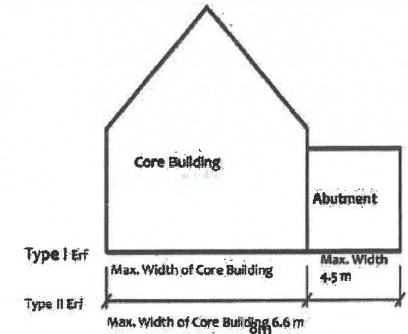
Diagrammatic section showing maximum width allowed for abutments for Type I and Type II erven
